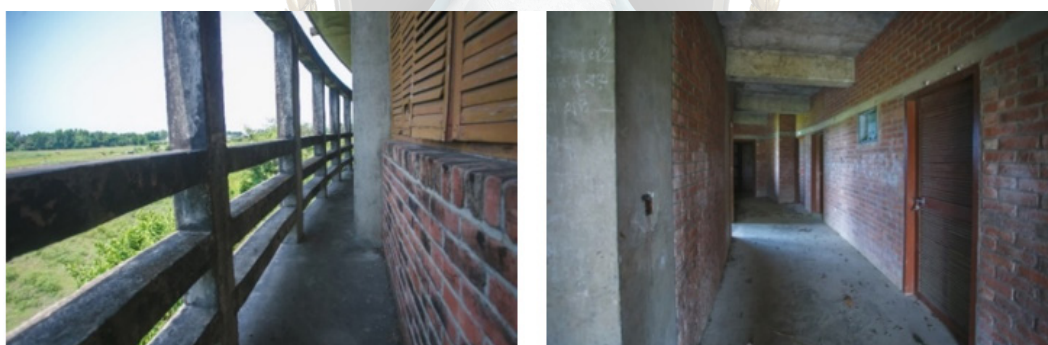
Existing condition of DASCOH Cyclone Shelter (Photo: Author)
